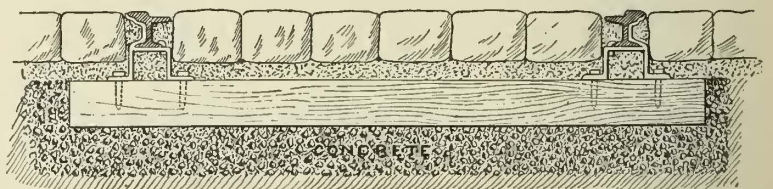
CROSS SECTION GIRDER RAIL ON CONCRETE FOUNDATION.
